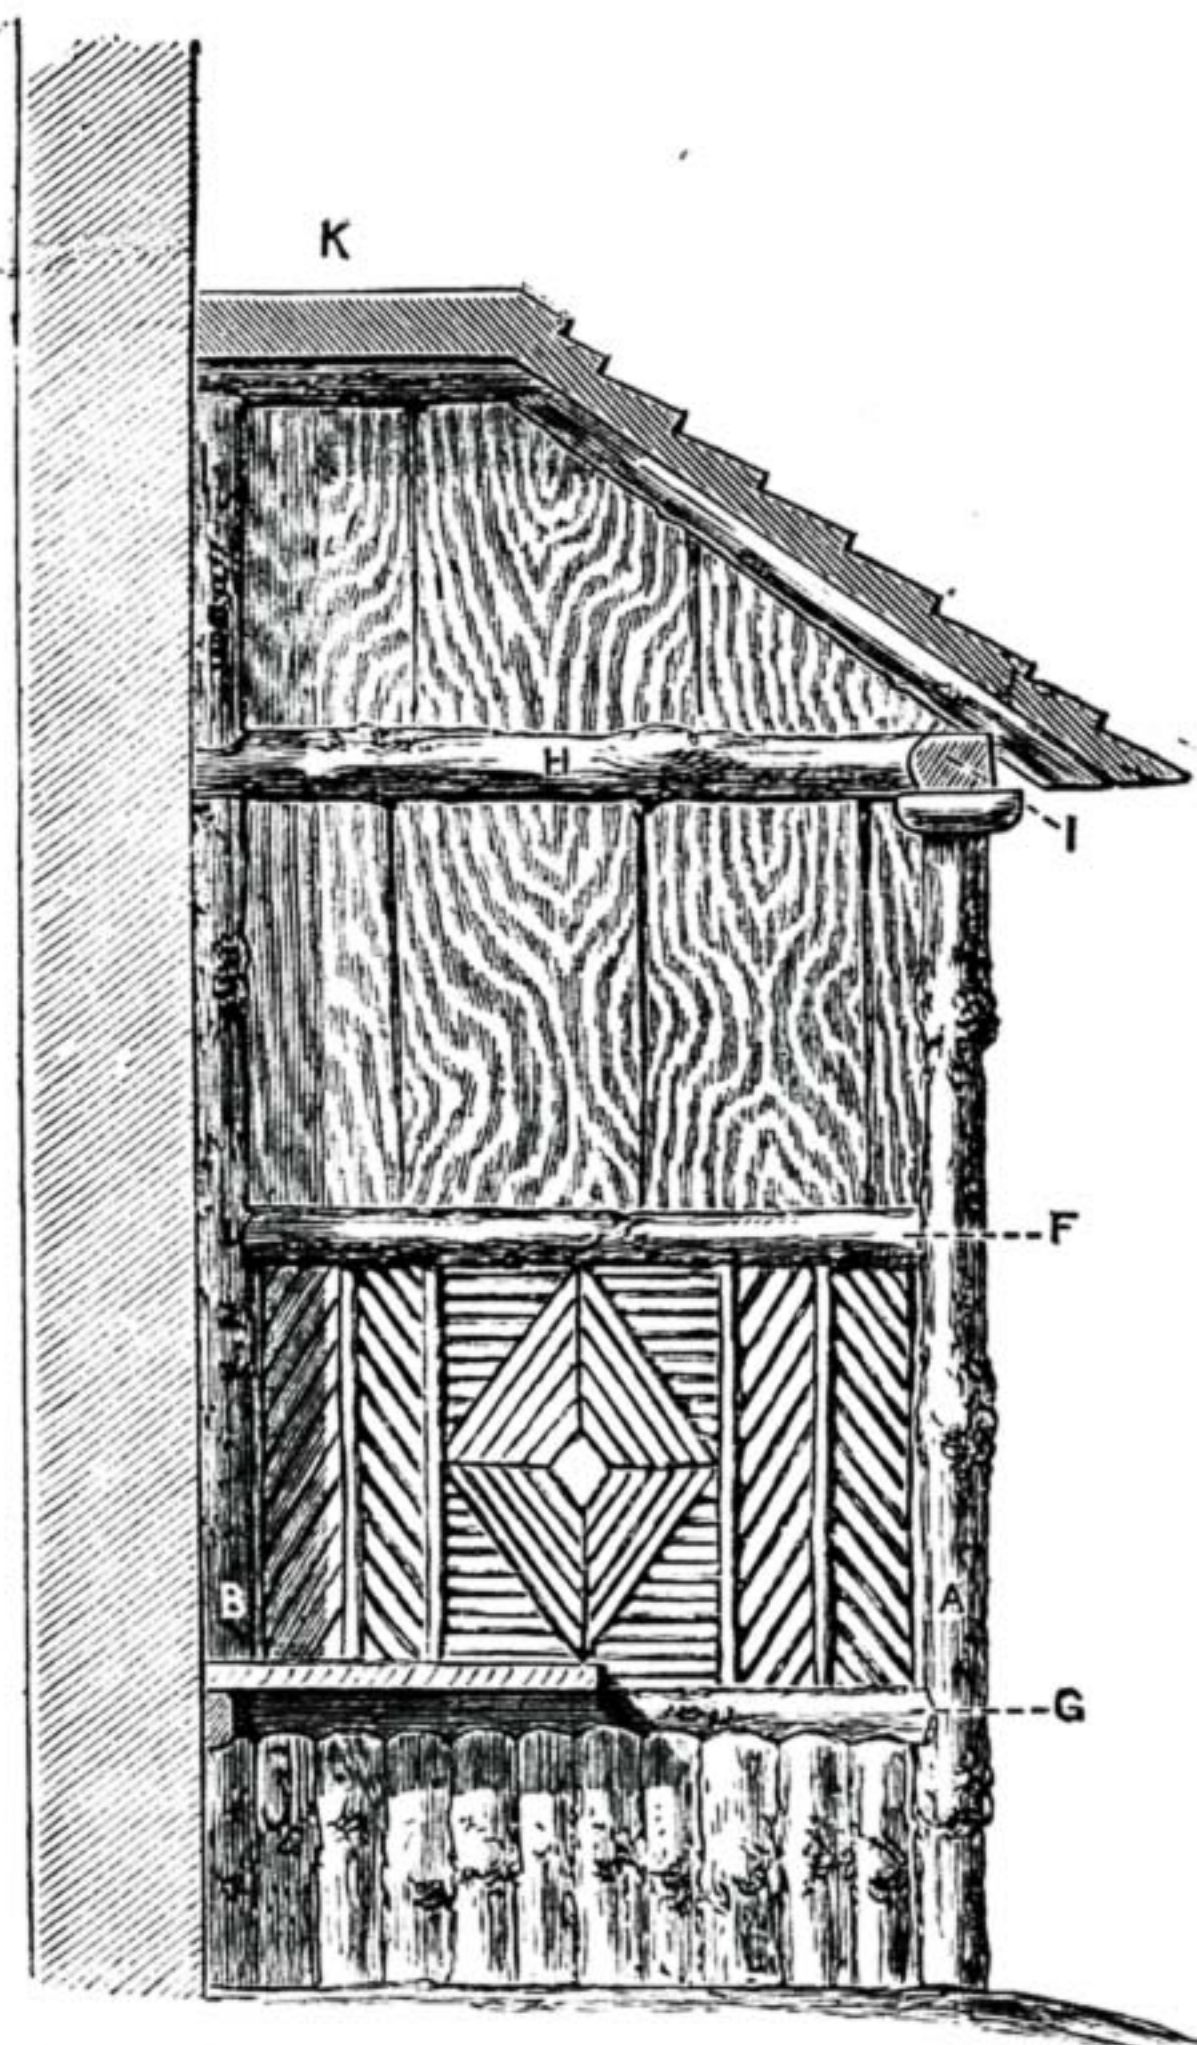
Inside of End of Lean-to Summer-House: Elevation.
